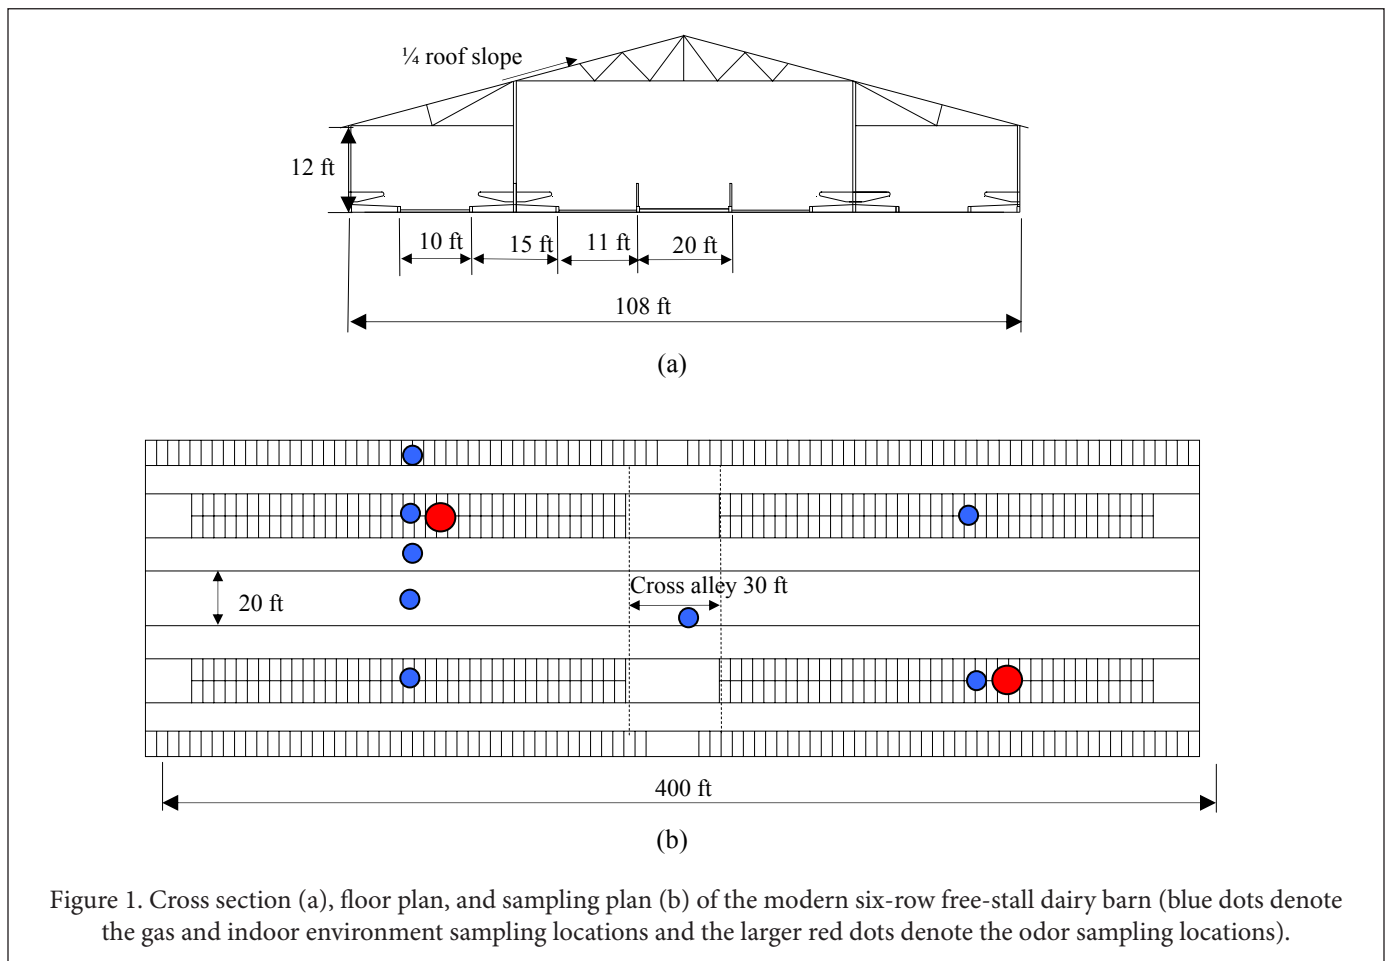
Cross section (a), floor plan, and sampling plan (b) of the modern six-row free-stall dairy barn (blue dots denote the gas and indoor environment sampling locations and the larger red dots denote the odor sampling locations).
